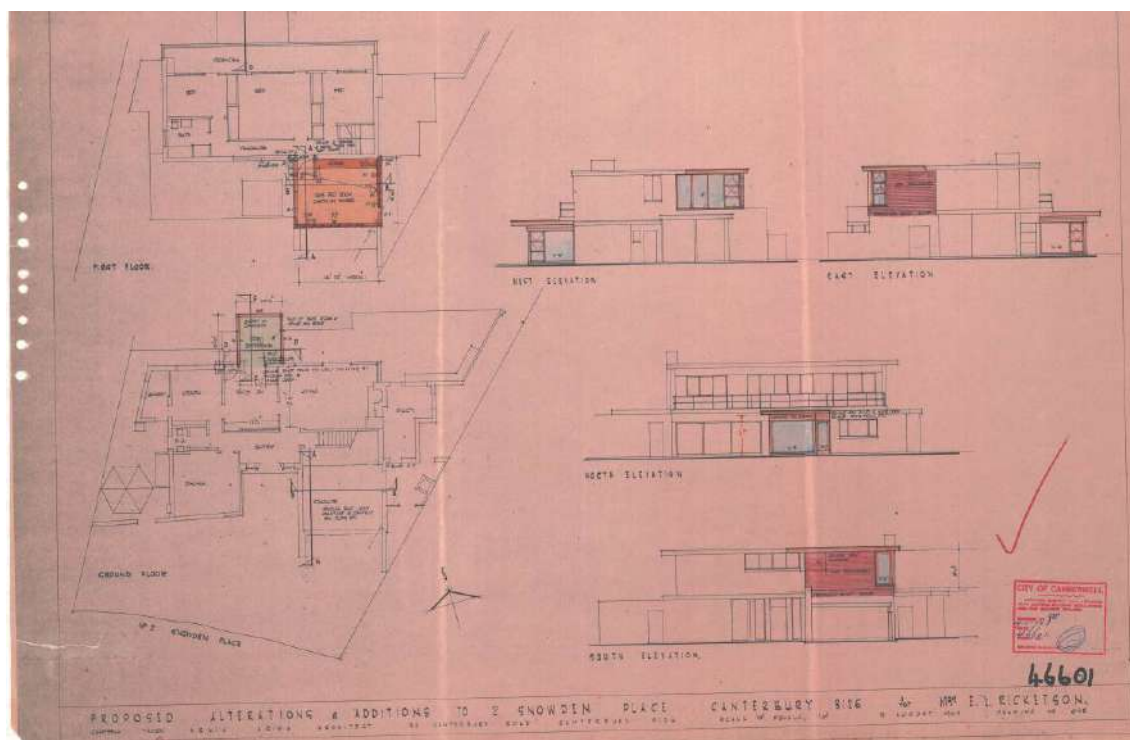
Architectural drawings for additions at 2 Snowden Place by Campbell Thorn, 1969. (Source: Building Permit 46601)
